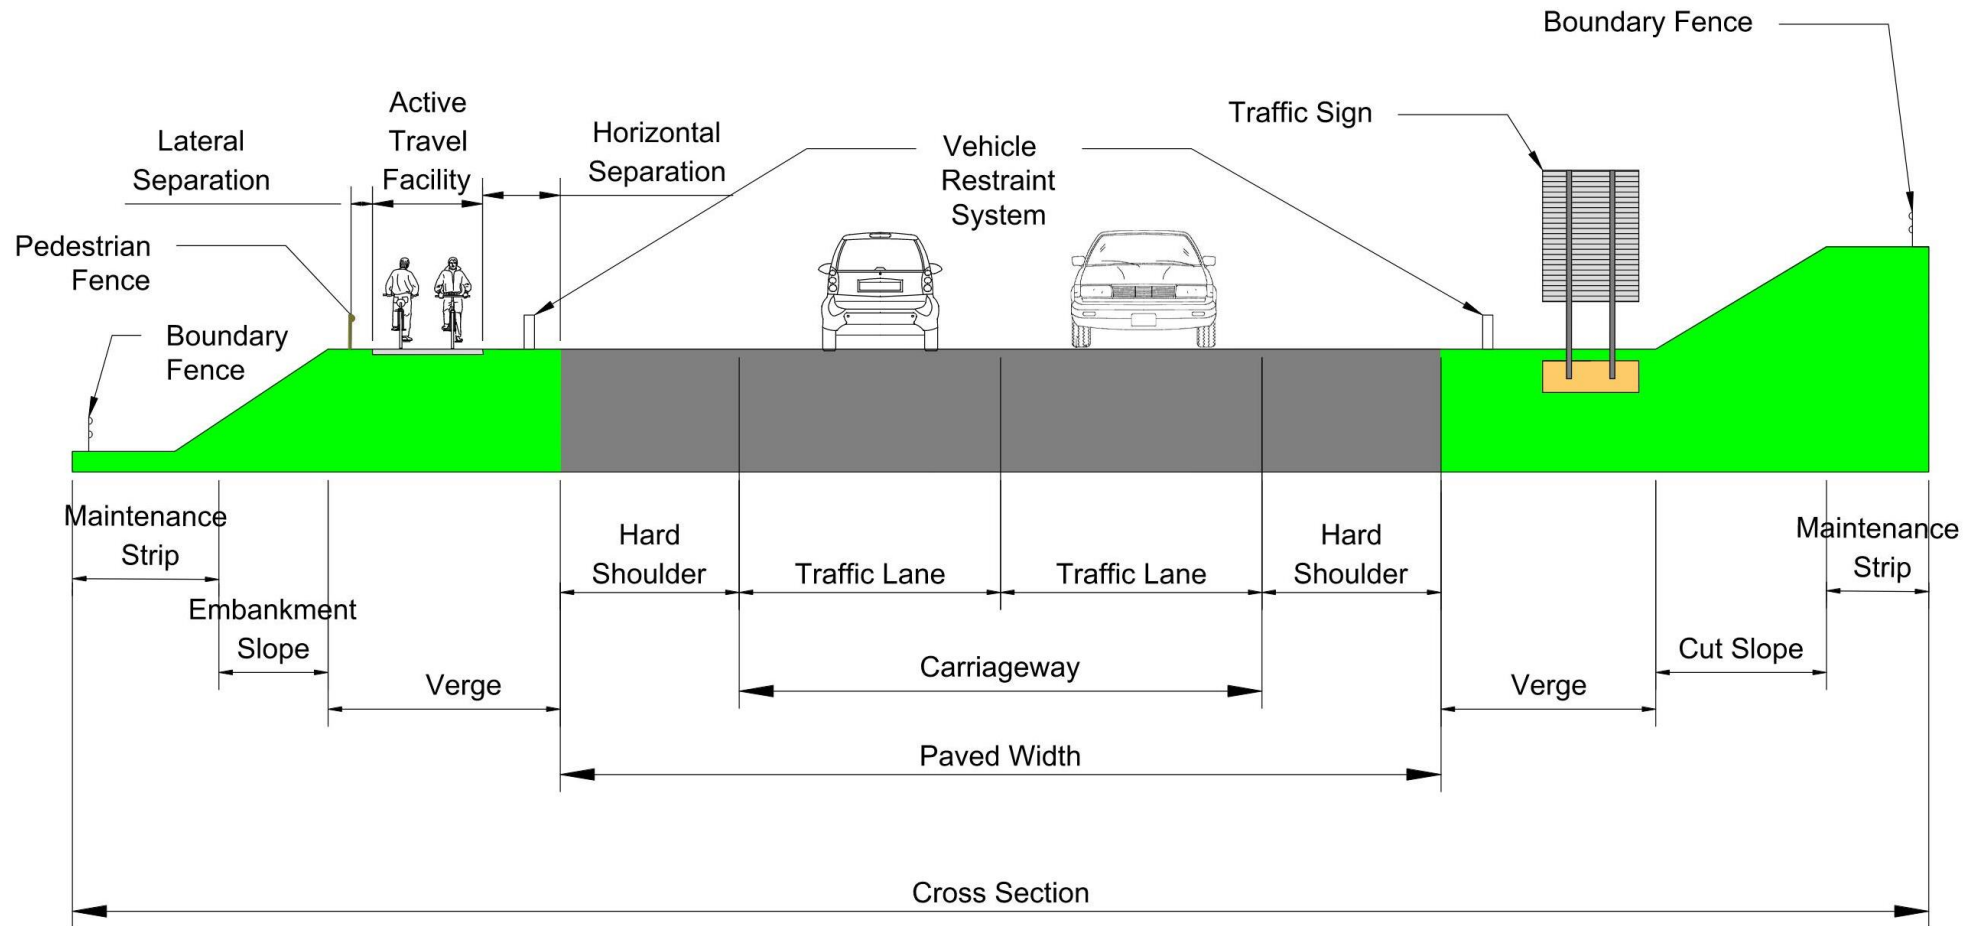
Typical Rural Type 1 Single Carriageway Cross Section Components
